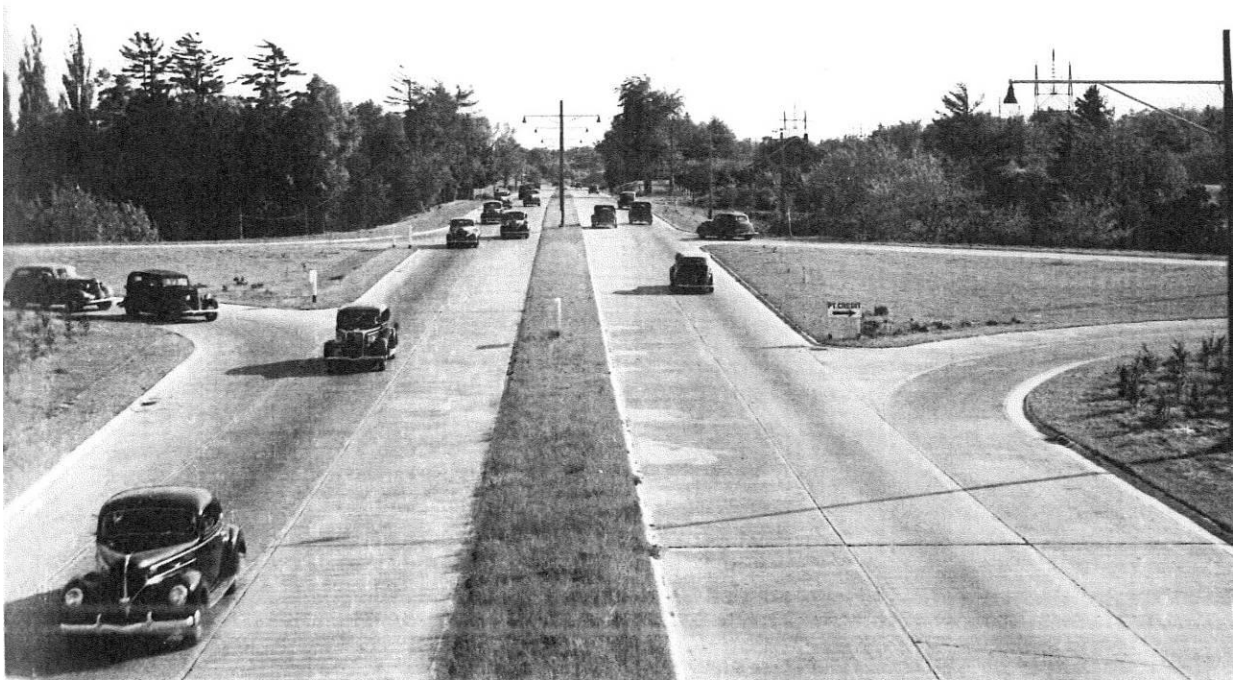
Photograph of the Queen Elizabeth Way, looking west at Highway 10, Jun. 1939, reproduced from an Archives of Ontario photograph in Robert M. Stamp, p. 21. On the left, note the dense tree cover in the vicinity of Belford's property.
